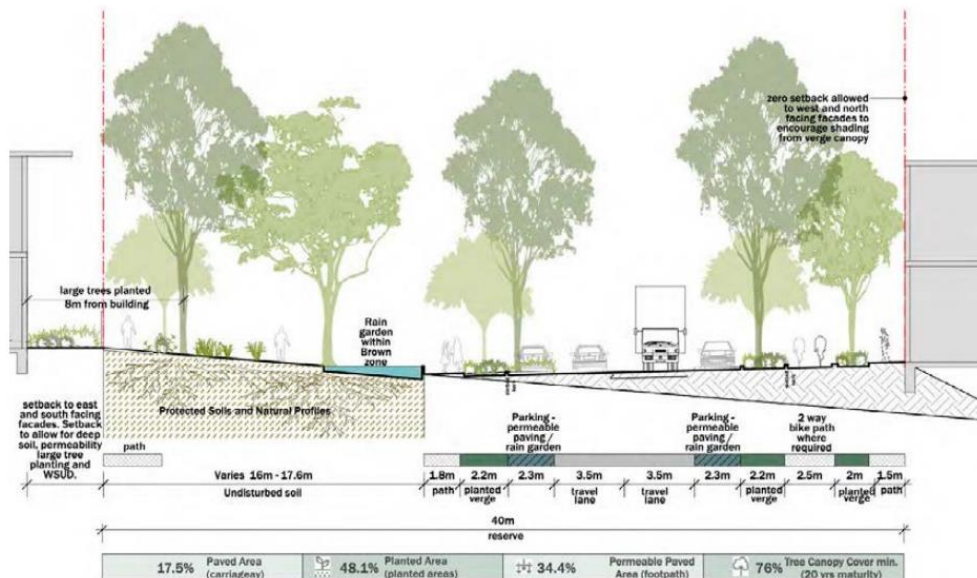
Draft Precinct Plan: Street Typologies – Local Collector Road
